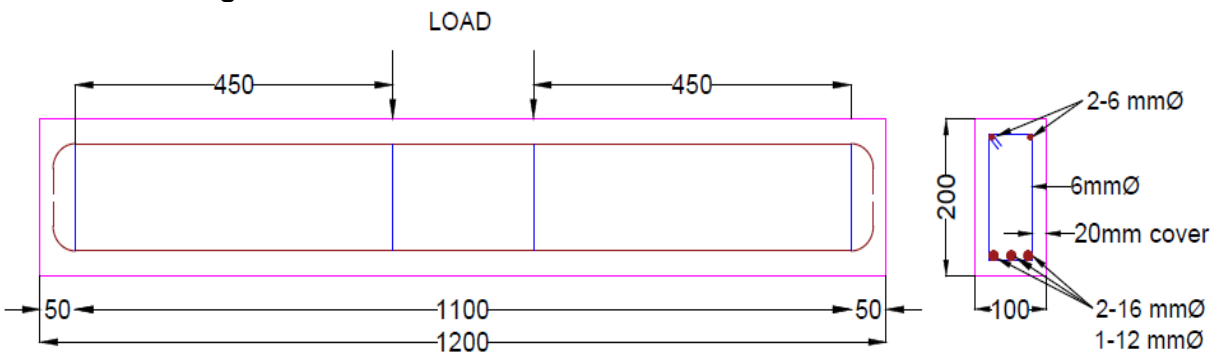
Details of reinforcement for M70 Mix with  $a/d=2$
